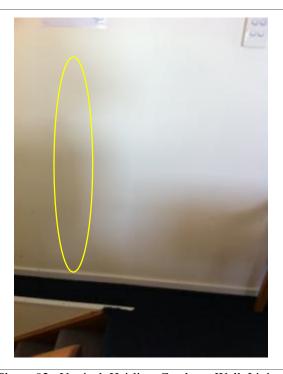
Vertical Hairline Crack at Wall Lining Joint Next to South Stair
